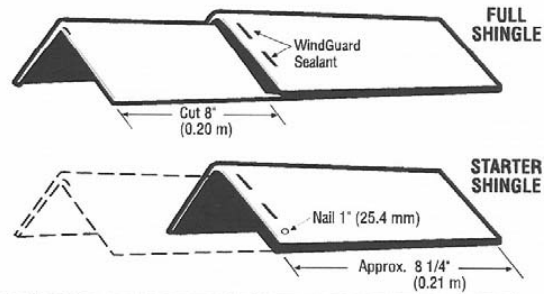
TYPICAL INSTALLATION DETAILS (Continued)
